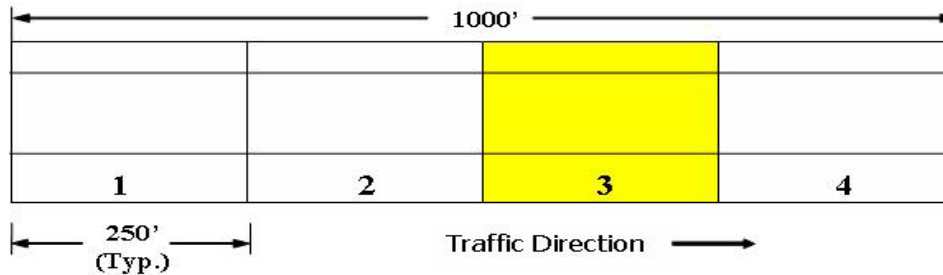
Overall PPCP section layout with driving lanes shown (25 panels per section; Section 3 is heavily instrumented)
